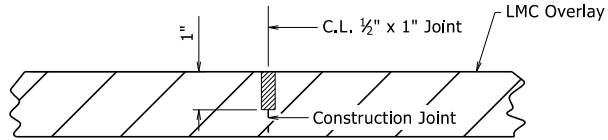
DETAILS OF HYDRODEMOLITION AND LATEX MODIFIED CONCRETE OVERLAY
